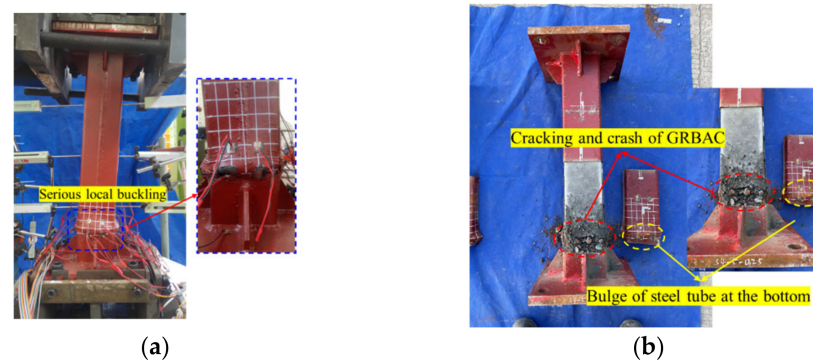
(a) Final overall failure mode of concrete for STG4-0.5-0.25; (b) damage of inner concrete of concrete for STG4-0.5-0.25.
